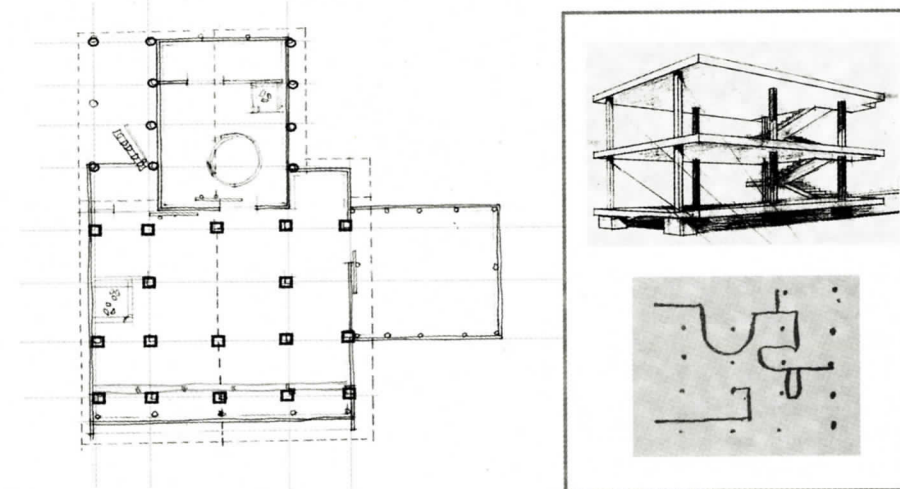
Modernist space – a flexible plan with freestanding pillars and movable walls.
